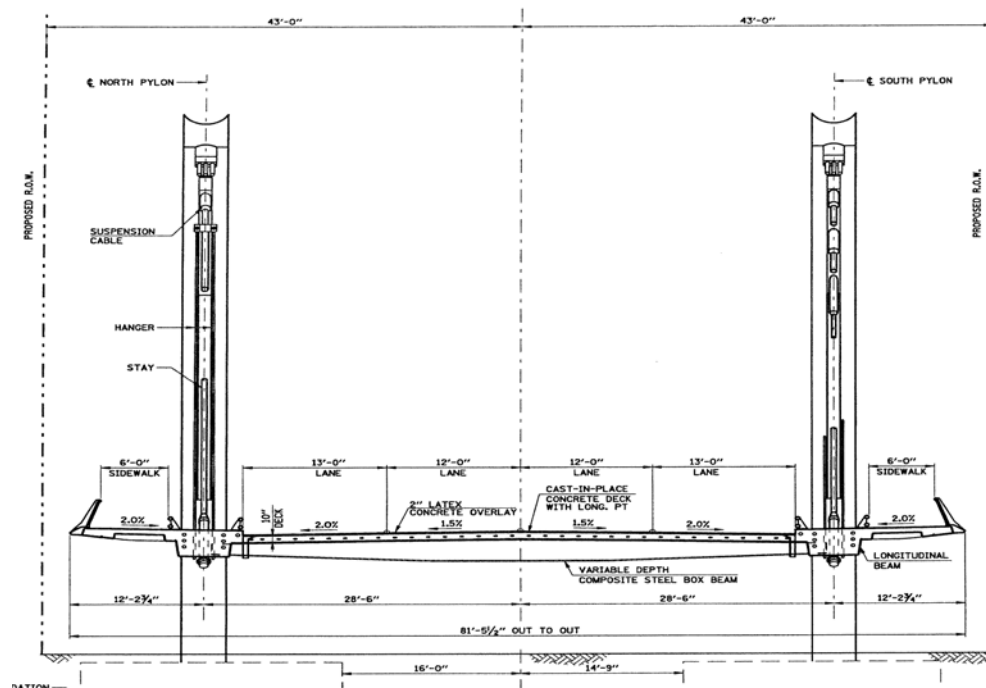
Bridge Cross-Section, *Courtesy of McHugh Construction / Bridge Concepts*³
